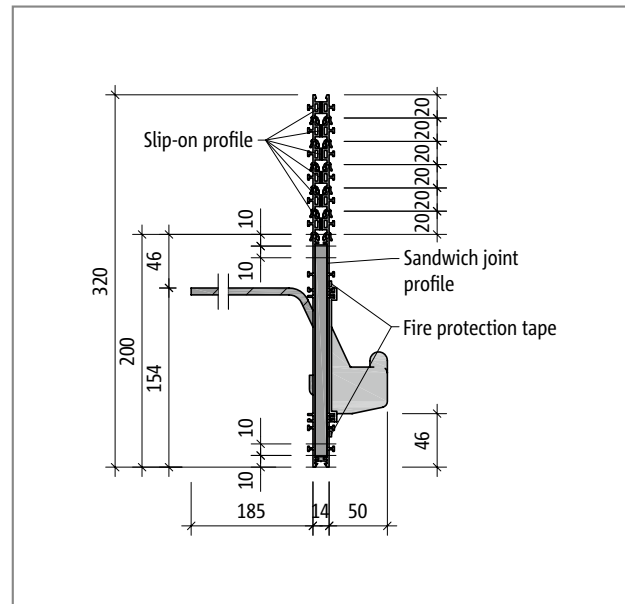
Schöck Tronsole® type T: Product cross-section with sandwich joint profile and slip-on profiles.
